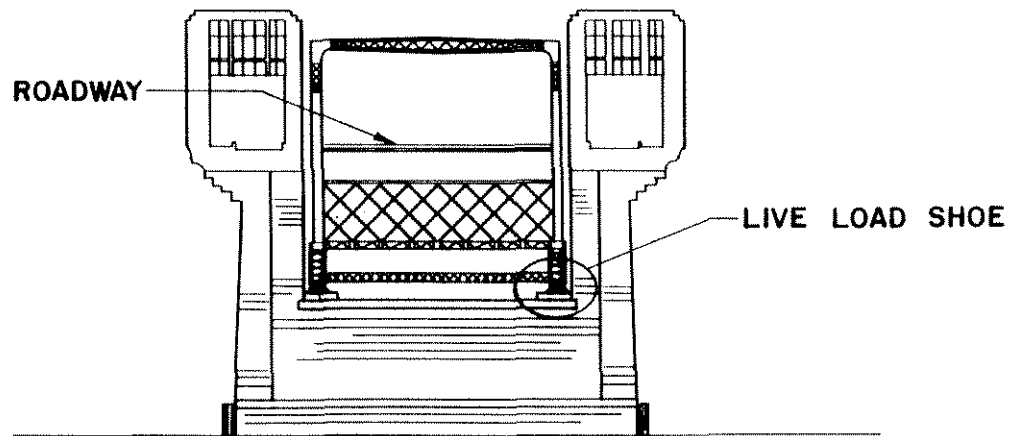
SECTIONAL ELEVATION SHOWING BOTH THE
